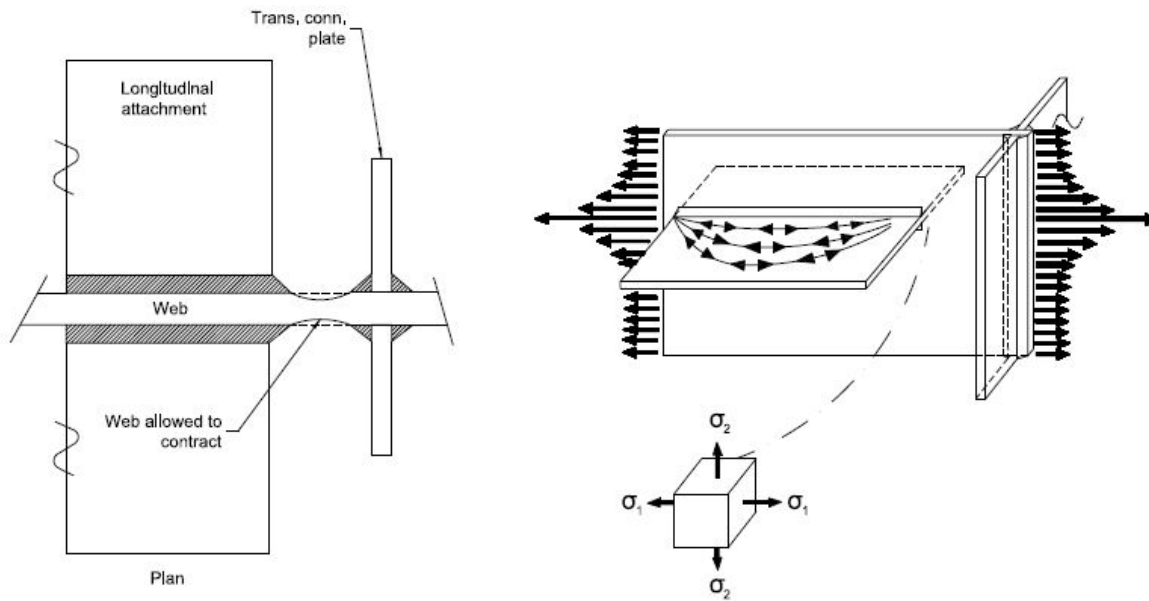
Illustration of local stress condition and natural deformations of girder web at stiffener termination when detailed correctly.
